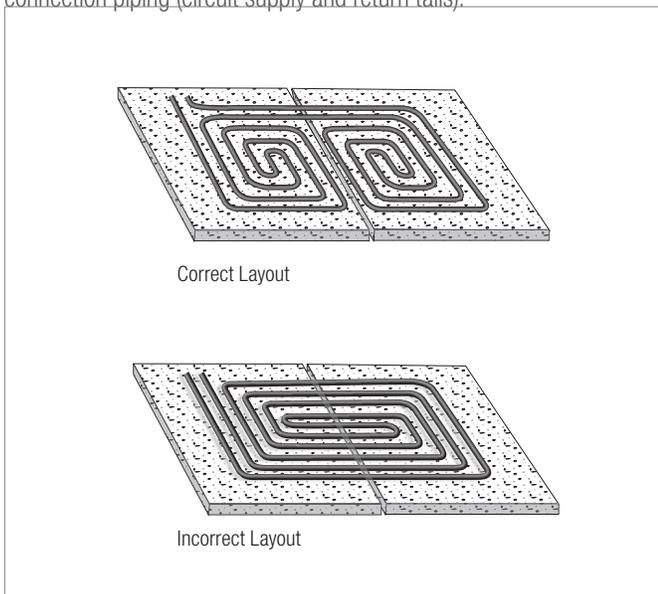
Layout of radiant heating pipe with a thermal mass joint
